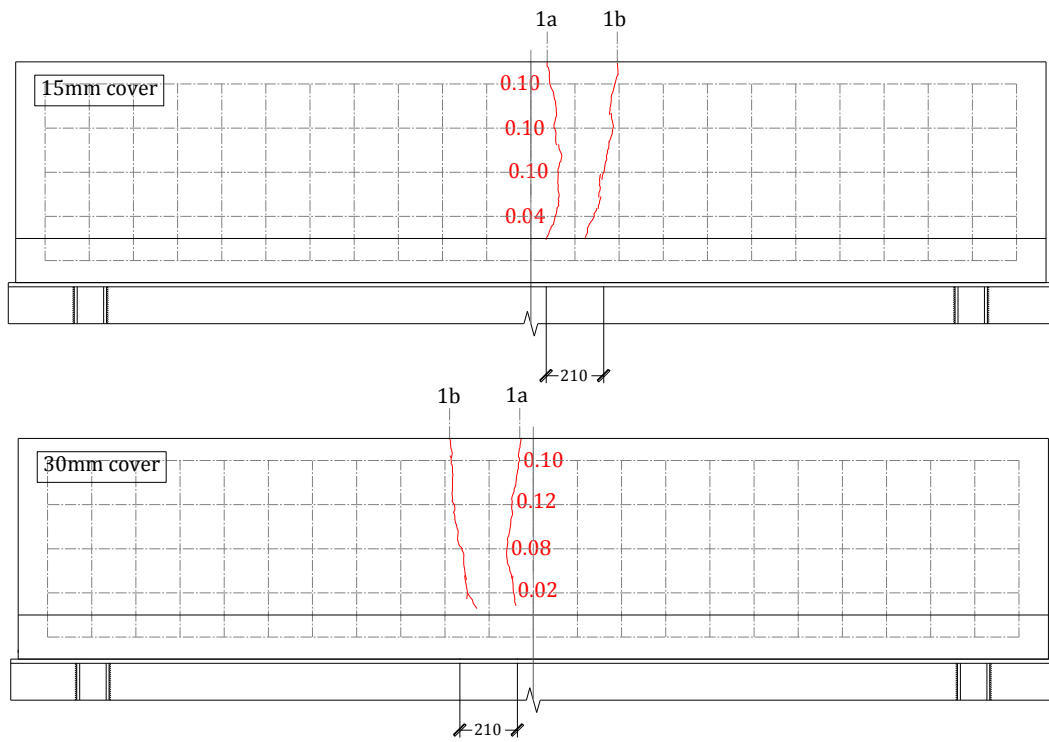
shows the crack pattern and crack widths in both faces of all walls. Cracks are shown in E-W1 at one week immediately before the wall was removed from the loading frame. The other crack patterns are shown immediately before final loading at around six weeks which was just before final loading of E-W3 and E-W4. Subsequently, further restraint induced cracks developed in E-W2 which was loaded later. A unique reference number is assigned to every crack in which the number refers to the week in which the crack formed and the letter to the sequence of crack formation within that week. Through cracks have the
